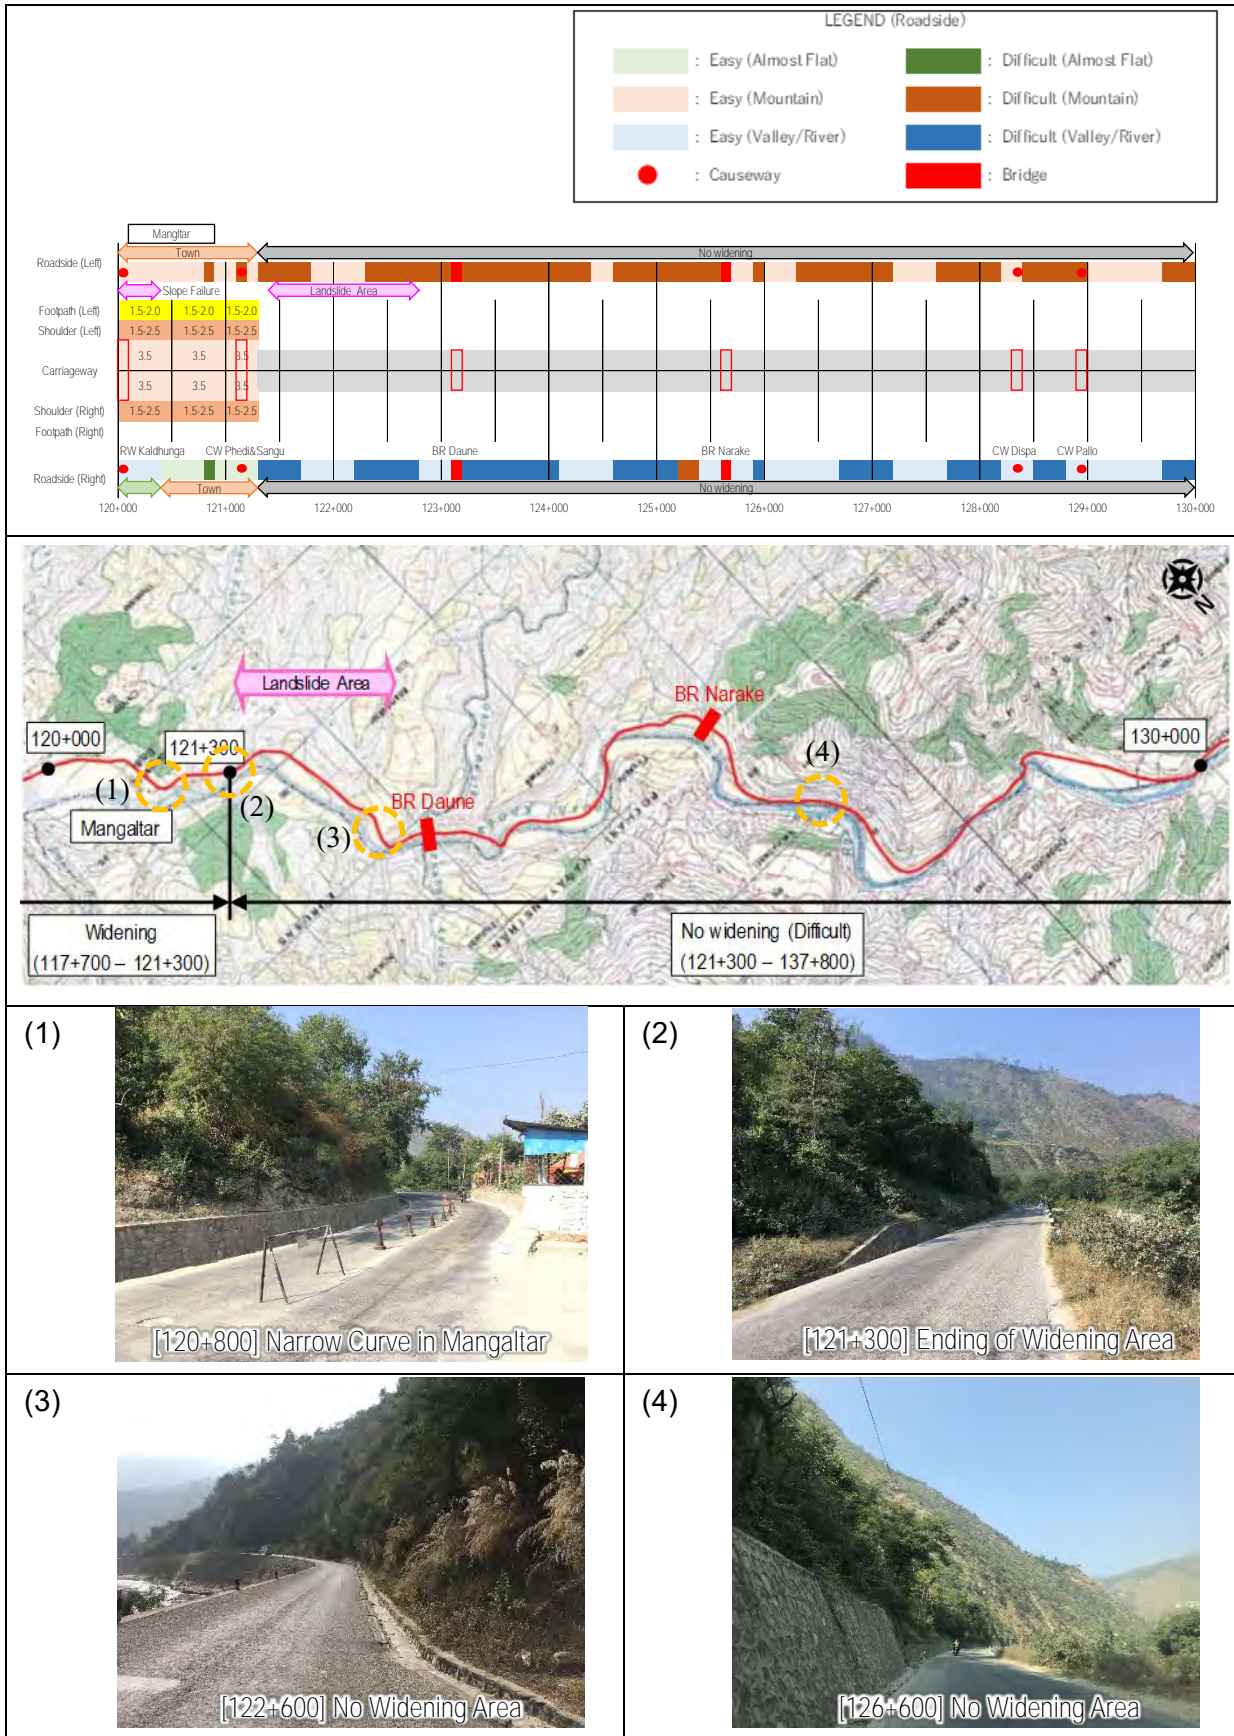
Example of Application of Cross Section Type (Ch.120-130km)
